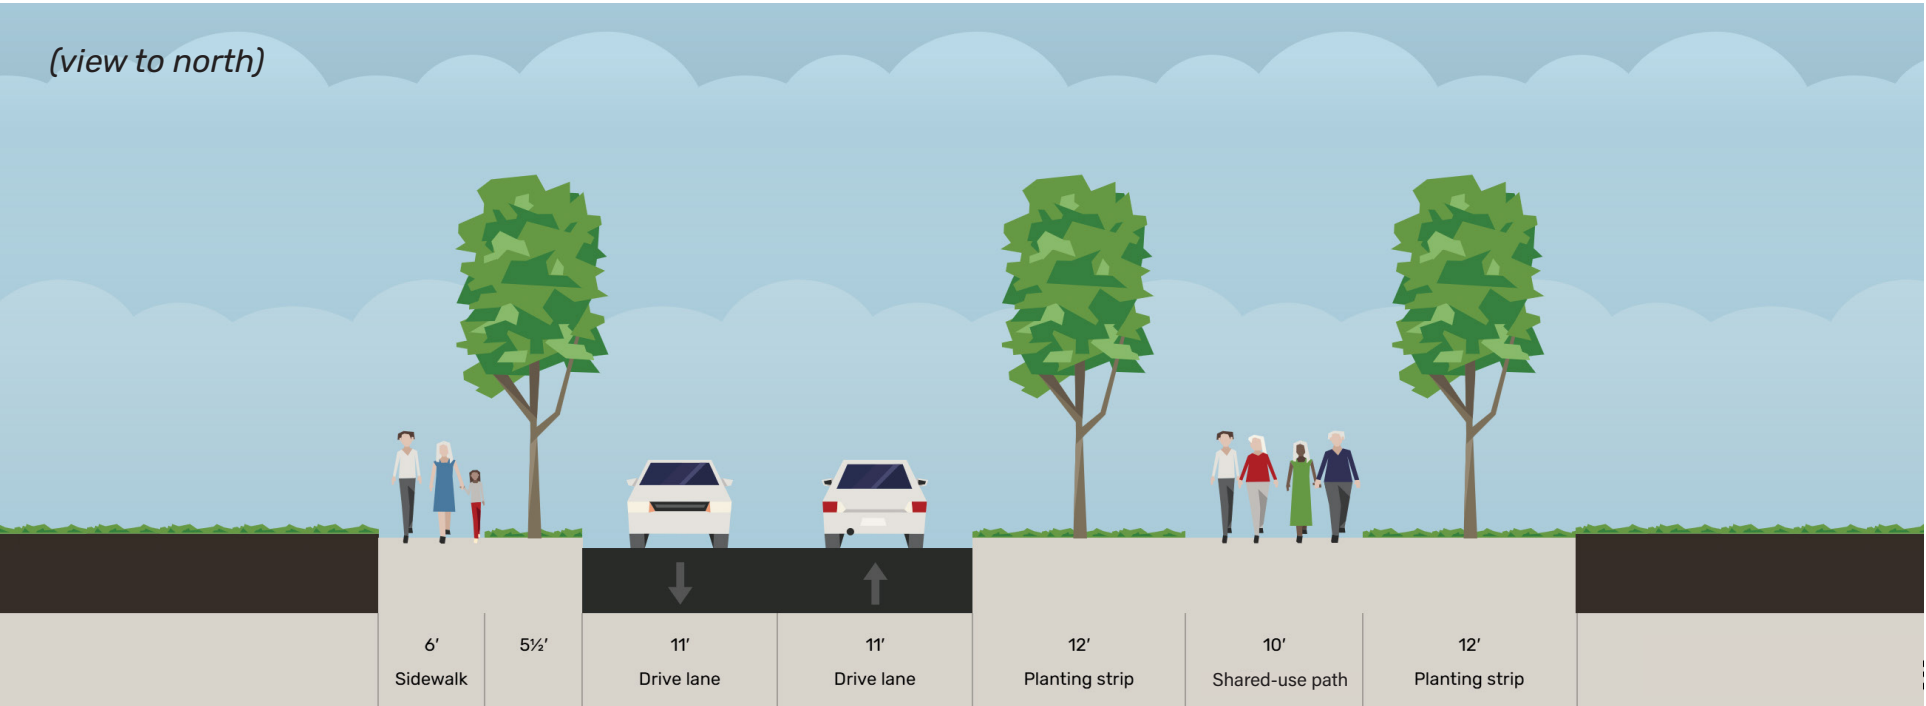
Proposed Typical Cross-Section on Post Oak Drive (Robinson Road to Lake Sharon Drive) (up to 80’ ROW)
